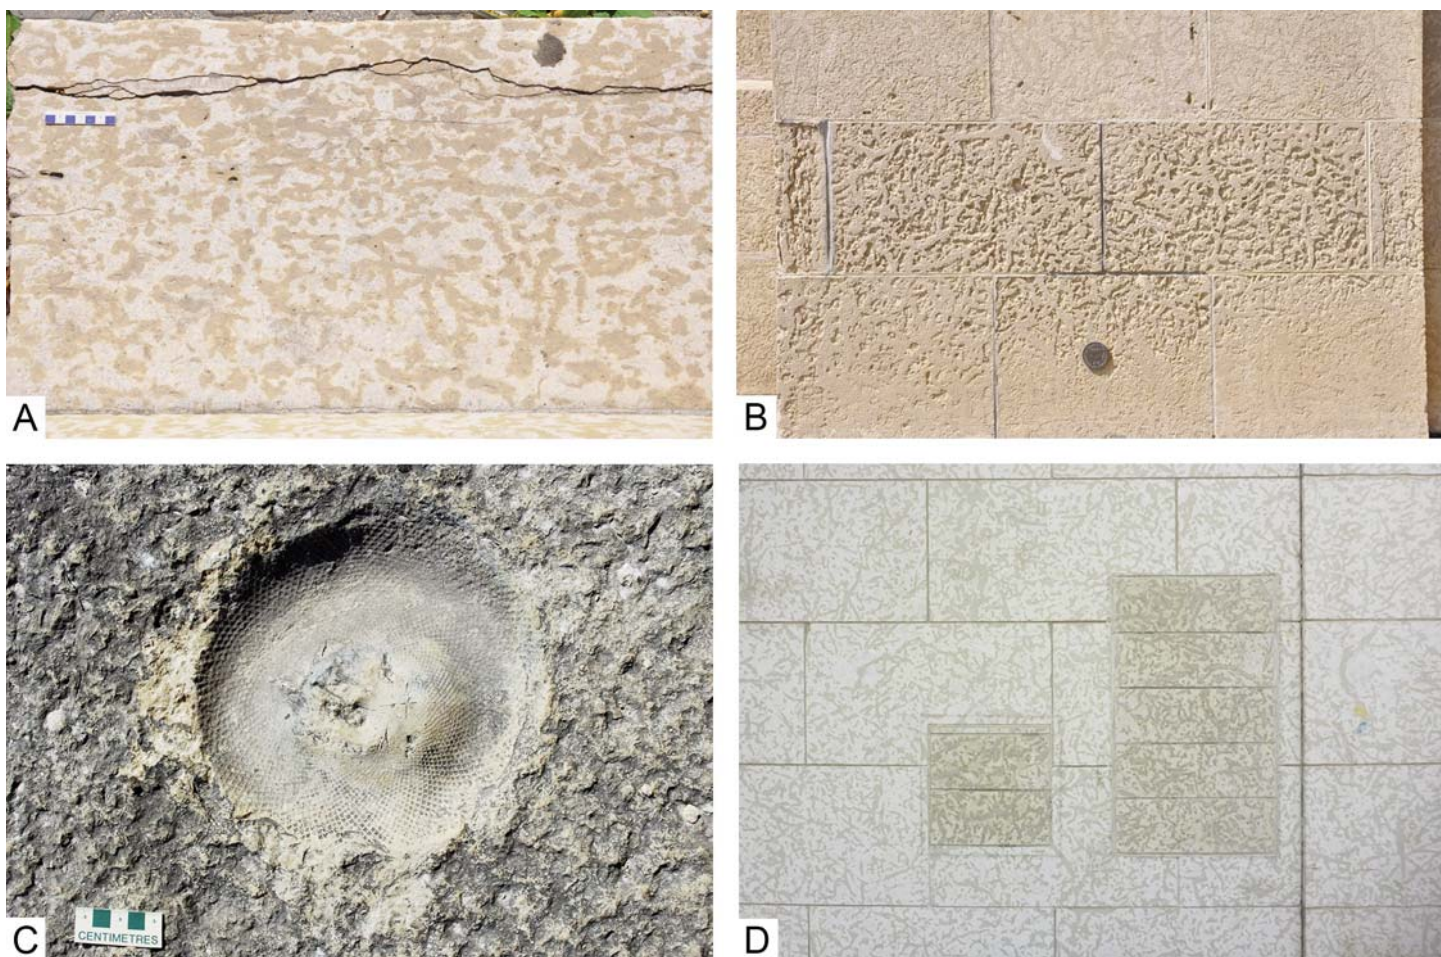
Examples of damage to Tyndall Stone. A. Looking down on plinth with vertically oriented cracks. Winnipeg. Scale in centimetres. B. Weathered bush-hammered foundation slabs, with Canadian Geodetic Survey levelling benchmark tablet (lower centre). Courthouse, Humboldt, Saskatchewan. Width of view approximately 1.5 m. C. Upper surface of stairway retaining wall block with concave mould of receptaculitid, which has popped out. Manitoba Legislative Building. Scale bar in centimetres. D. Cladding of old bank building with night depository drop box portals replaced with stone having different sizes and hue. Prince Albert, Saskatchewan. Width of view approximately 1.5 m.
